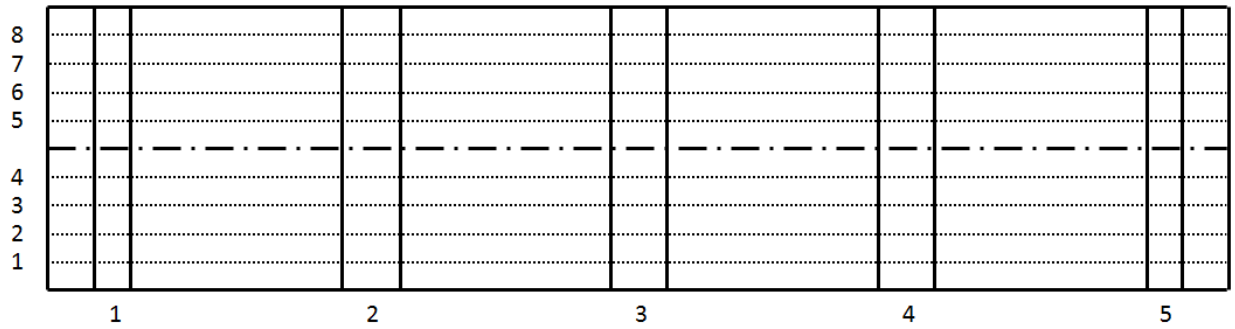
Capbeam and Pile Locations for the Wreck Creek Bridge
